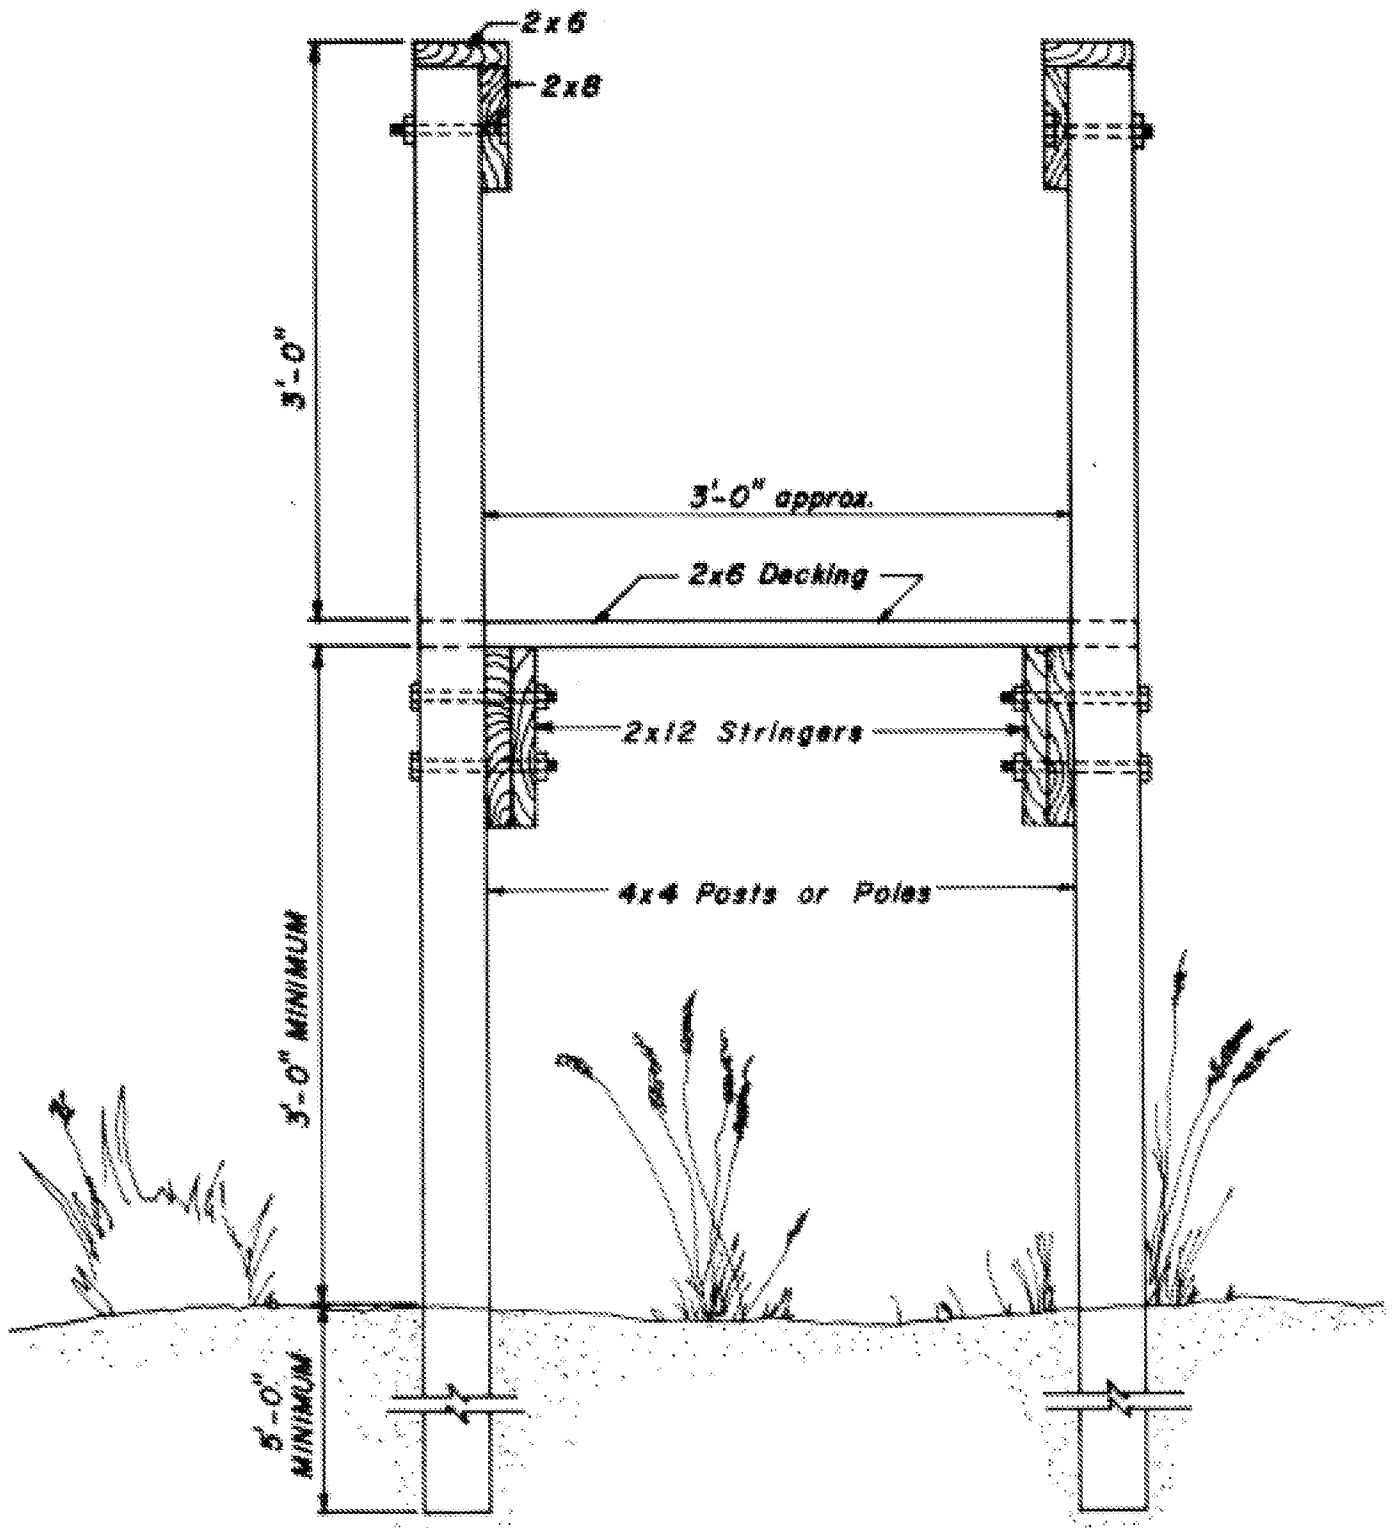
TYPICAL SECTION scale: 1" = 1'-0"
